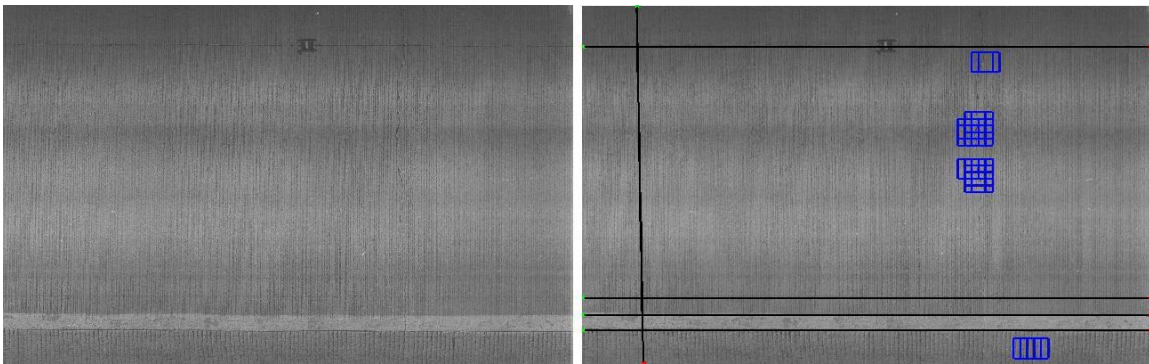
Example 1 of medium-severity concrete crack: raw crack (left) and crack detection (right)
